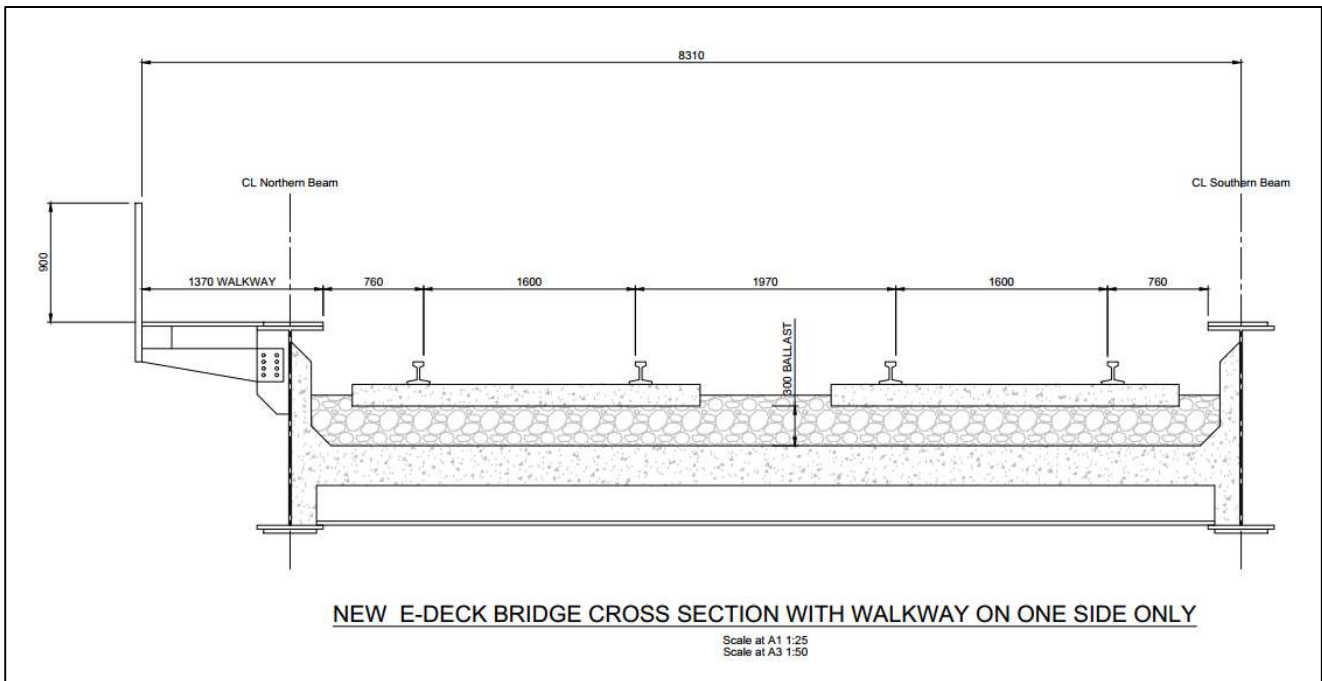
Typical cross-section of a ballasted track deck for one of two bridges
